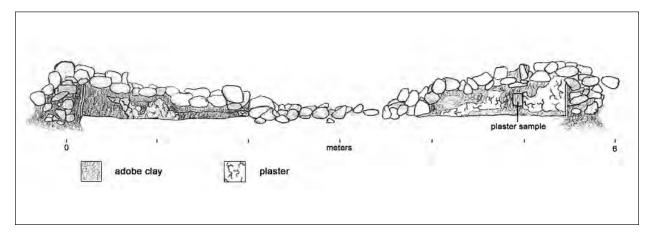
Elevation of doorway, Structure 2, LA 105710.
